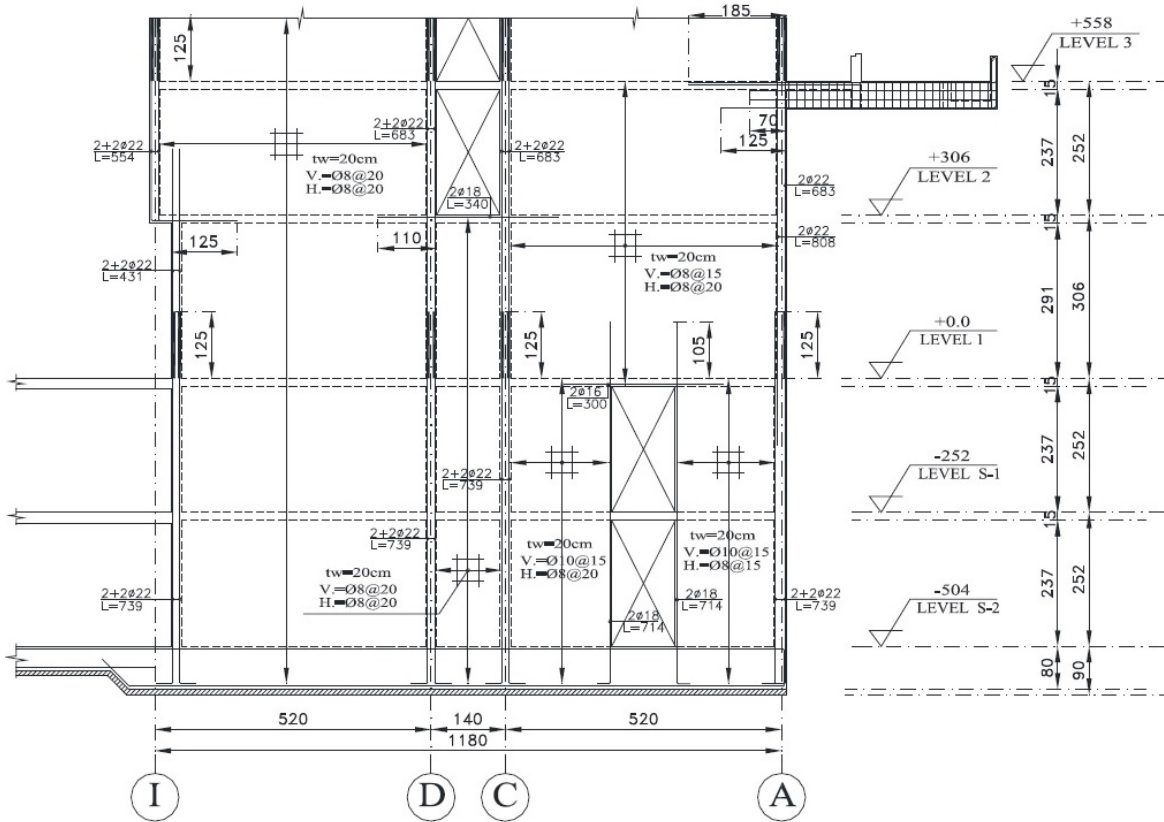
Elevation view of axis 13, dimensions in cm (1 cm = 0.39 in.).
